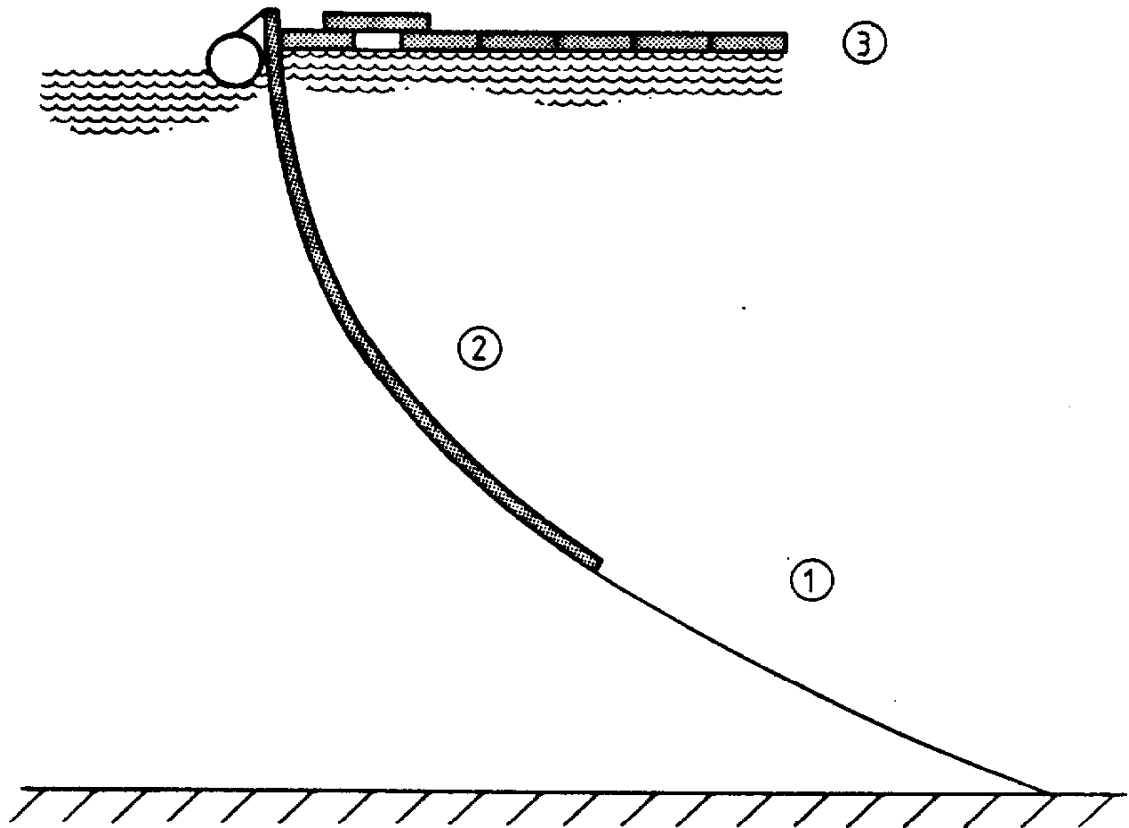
LAKE HEAT STORE : ANOTHER CONCEPT FOR SURFACE INSULATION AND SIDE WALL (SWEDEN)
